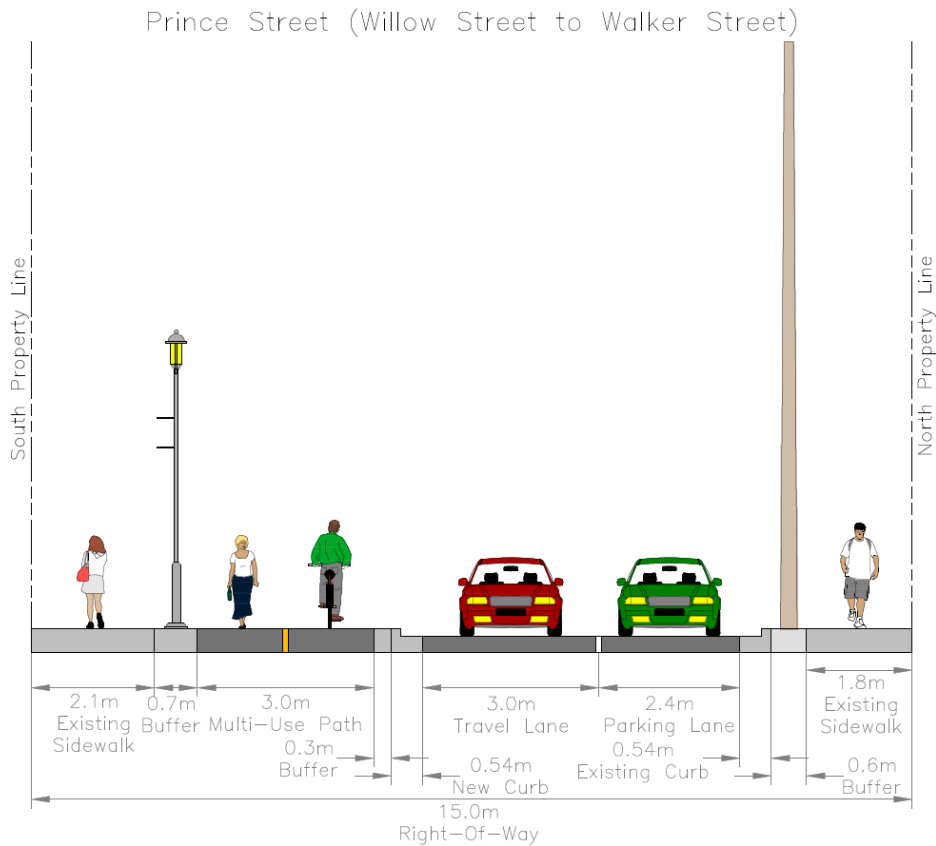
Prince Street between Willow Street and Walker Street, Revised Cross Section
